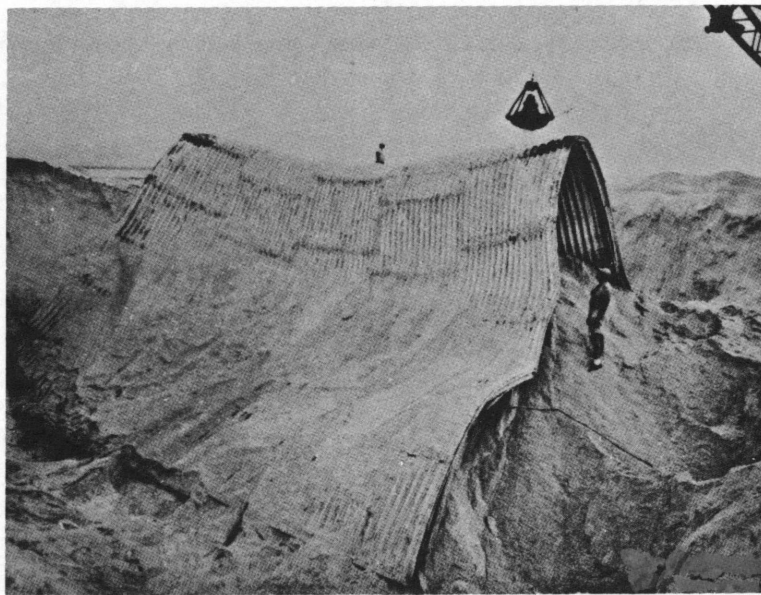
Structure 3.2d, infiltration of sand after end-wall failure; looking toward GZ.
